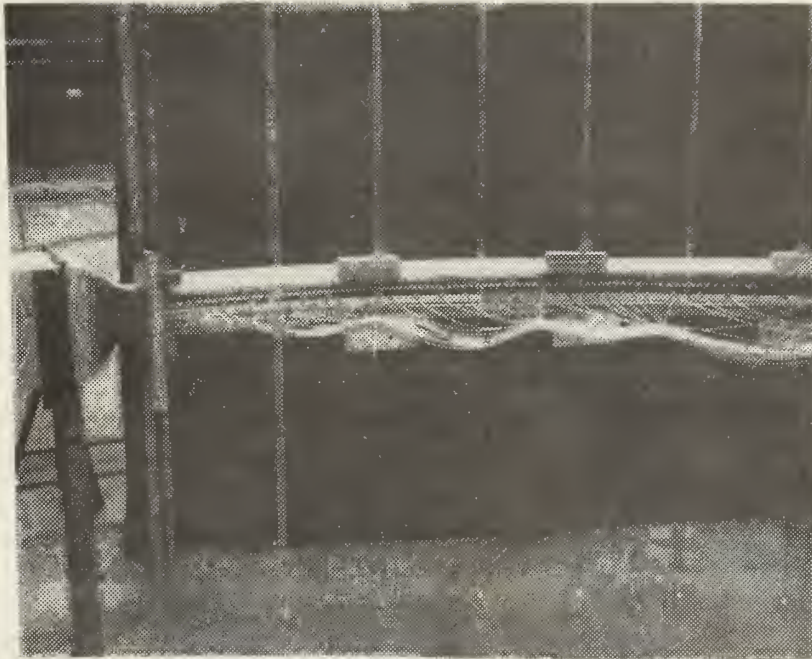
b. Pressure Port Location and Vertical Wall Construction
